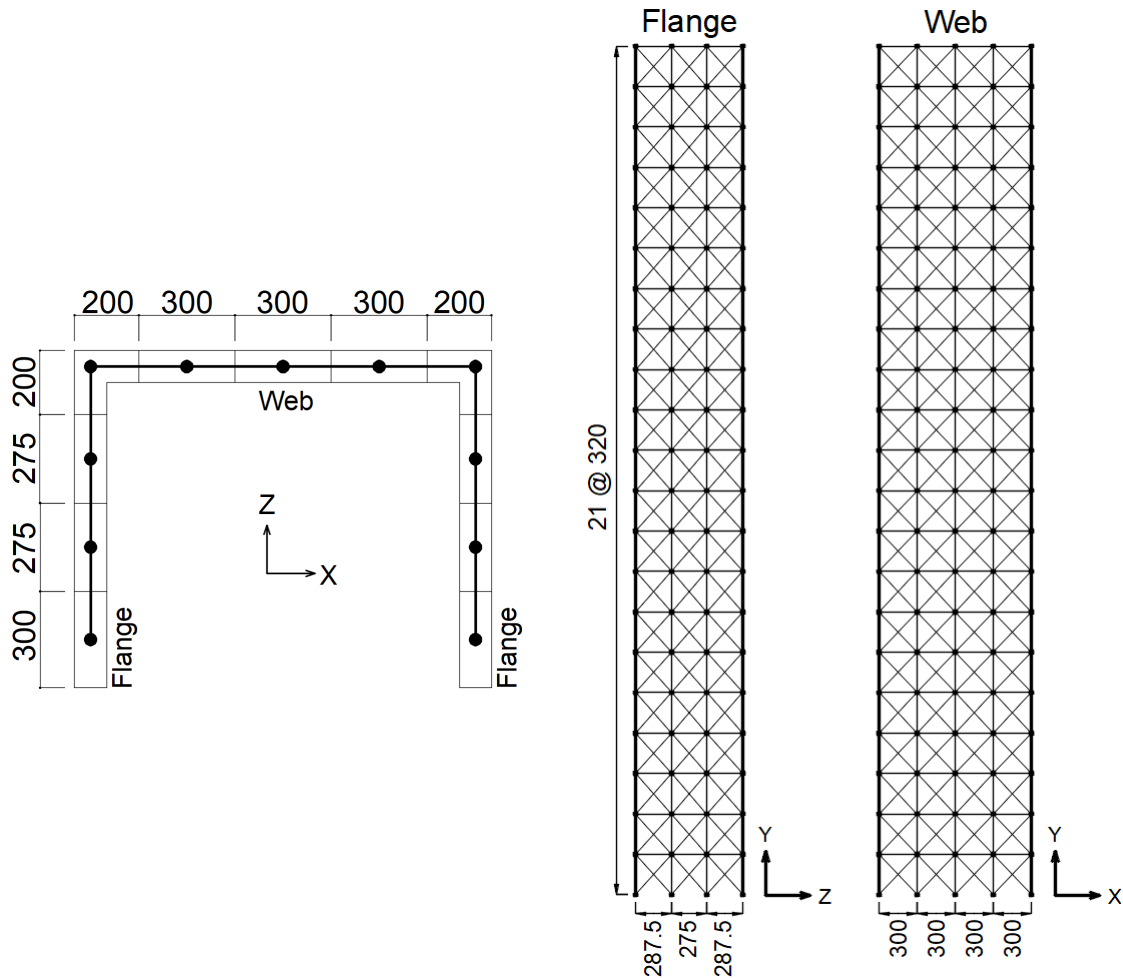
Plan and elevation views of the beam-truss model for UW1 [Unit: *mm*].
